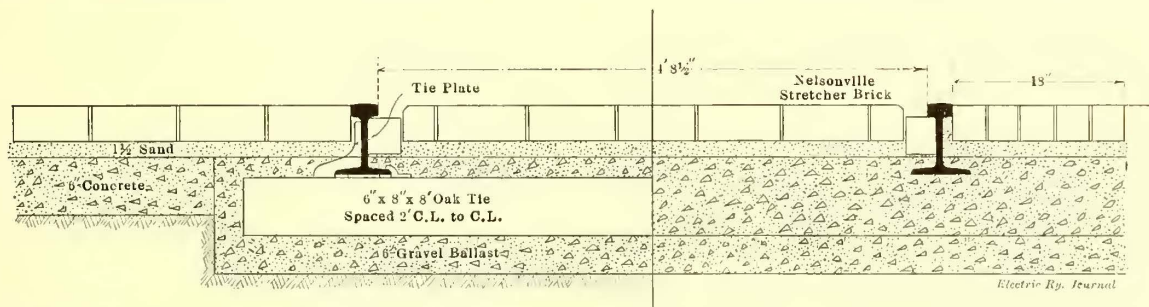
Indianapolis Traction & Terminal Company—Standard Construction on Gravel Ballast in Brick Pavement
